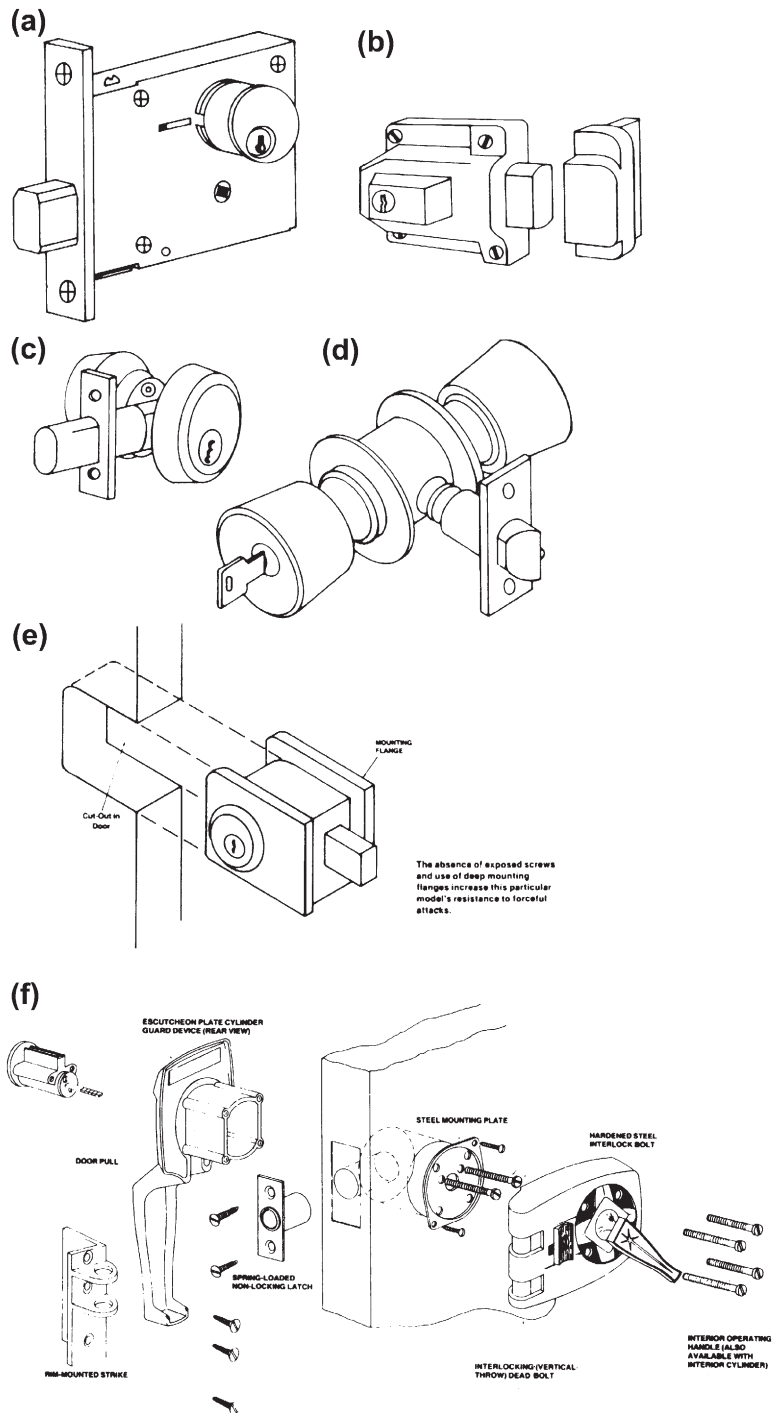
Lock types: (a) mortise deadlock, (b) rim deadlock with rim strike, (c) tubular deadlock, (d) cylindrical (lock-in-knob) lockset, (e) unit lock, (f) Ideal Superguard Lock II. Note washers must be used for additional protection against cylinder pulling. These are not supplied with the lock.
